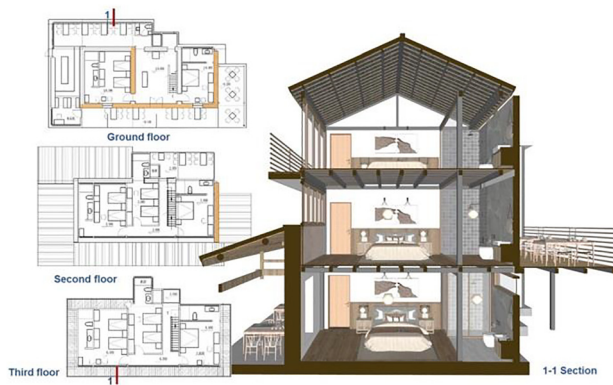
Architectural design plan and section (Source: drawing by Shi Yongting)
